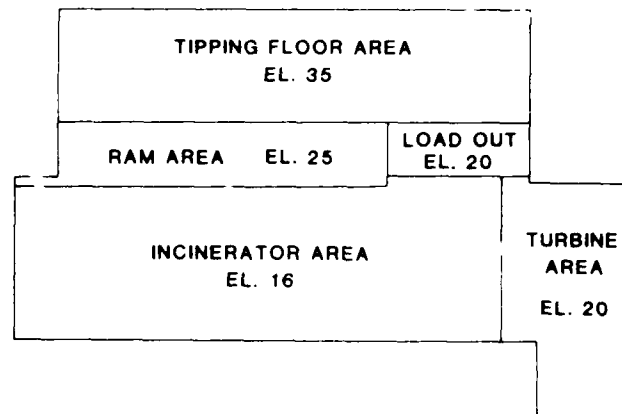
EGF FINISH FLOOR ELEVATIONS
